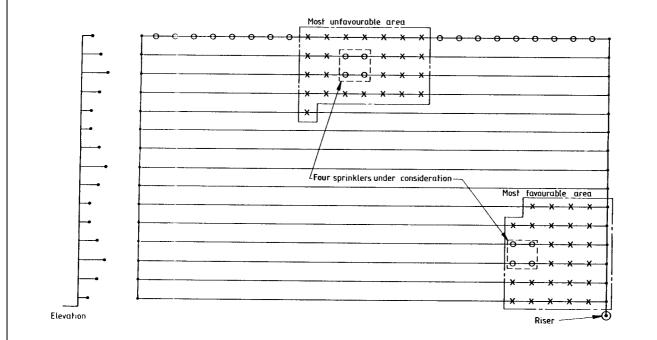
Typical hydraulically most favourable/unfavourable locations of AMAO in an installation with gridded piping
